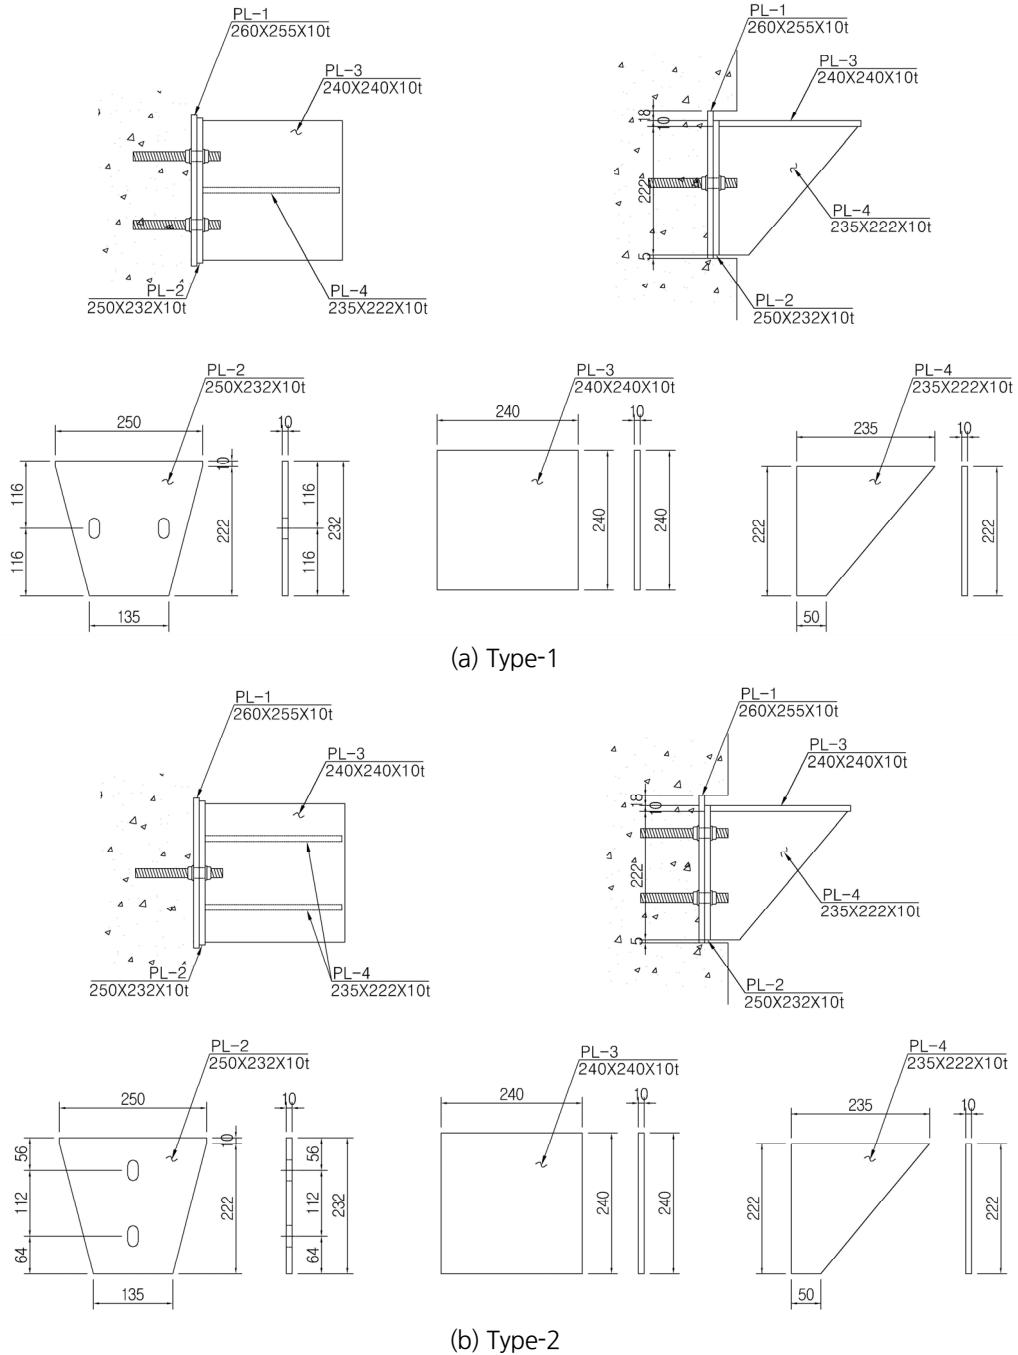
Two types of embedded bar-type anchor bolt brackets
